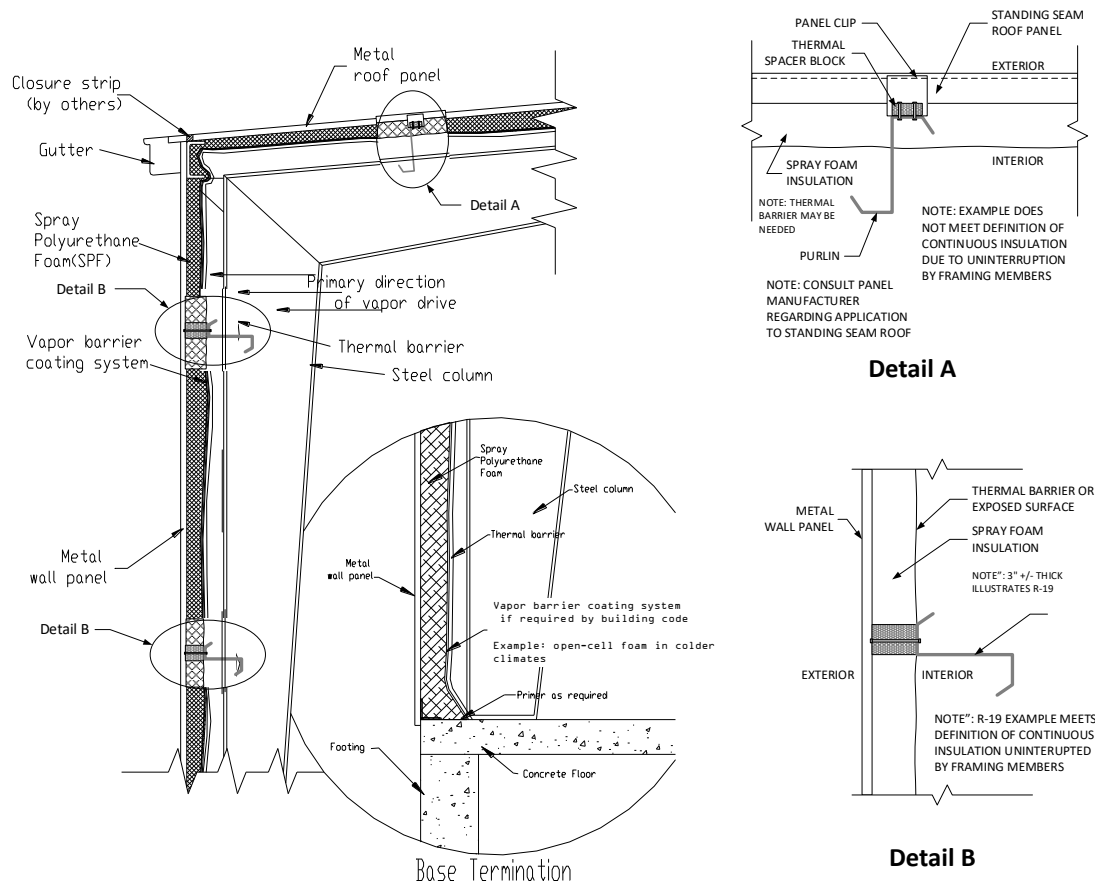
Vapor Drive Toward Outside SPF Applied on Interior. Details A and B from Figures 5.2.11 and 5.2.14 in Metal Building Manufacturers Association (MBMA) document
